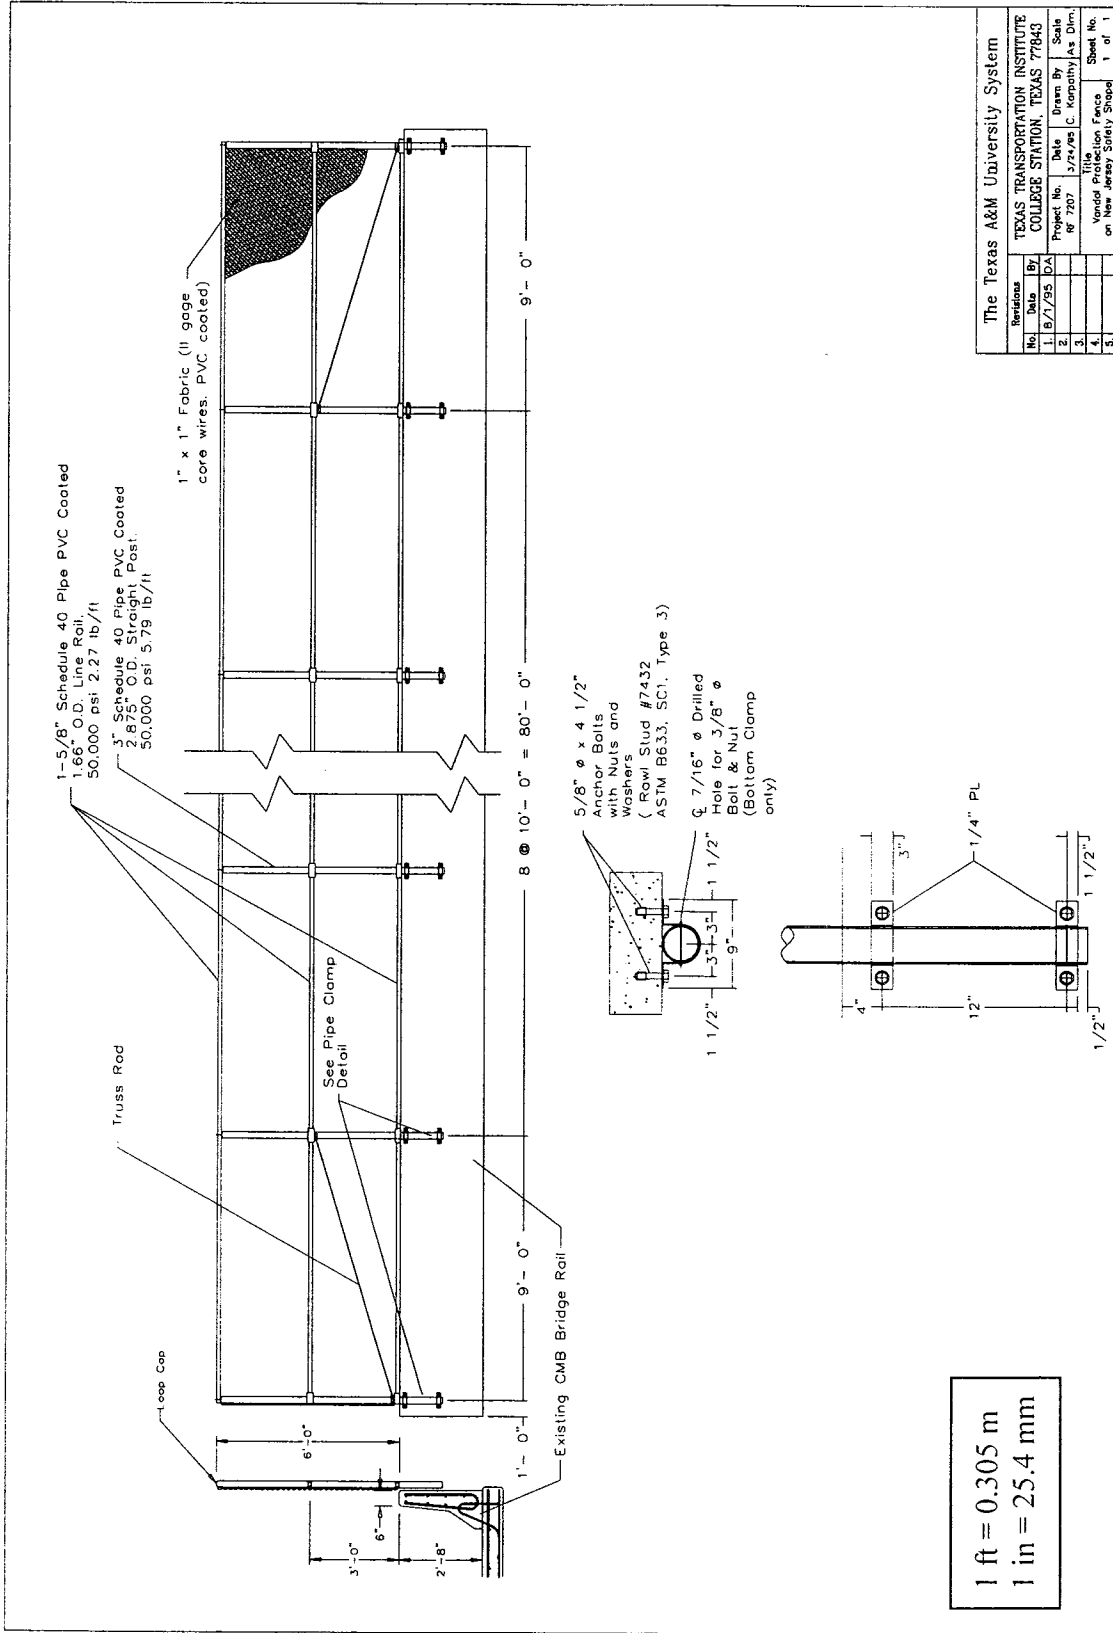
Details of vandal protection fence on New Jersey safety shape bridge railing.
